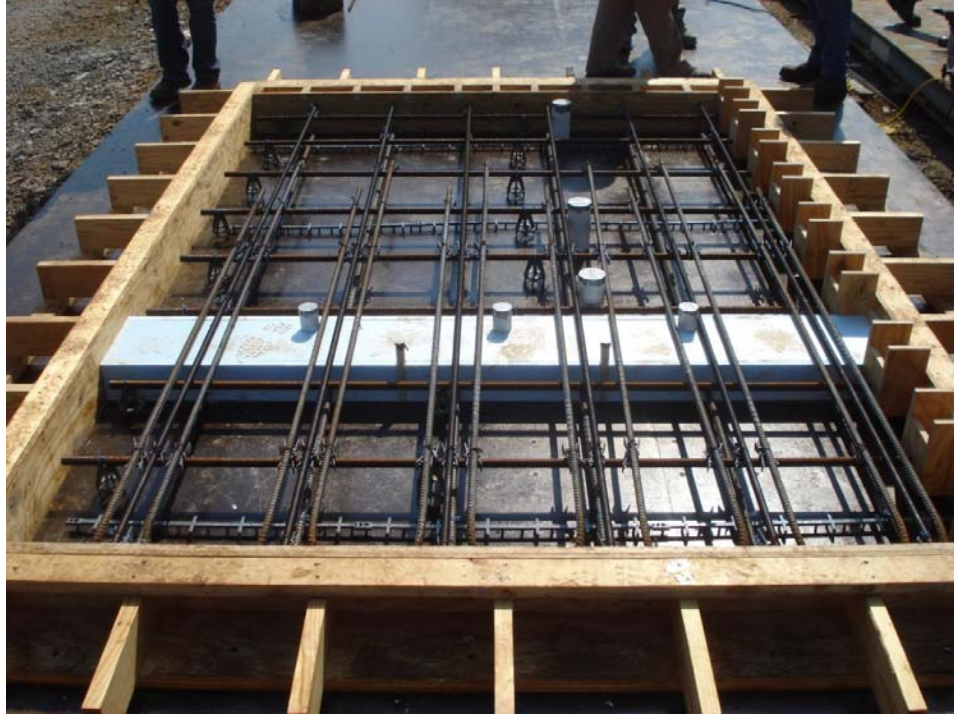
Typical Panel Formwork Looking Perpendicular to Girder Line
